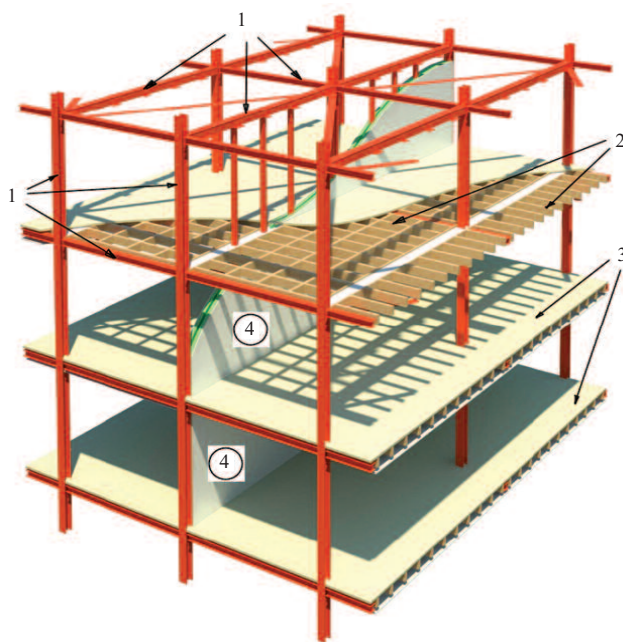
De Karel Doorman building in Rotterdam – hybrid structural system – diagram: 1 – modular steel frames; 2 – timber ceiling beams; 3 – CLT ceiling slab; 4 – frame walls between apartments
